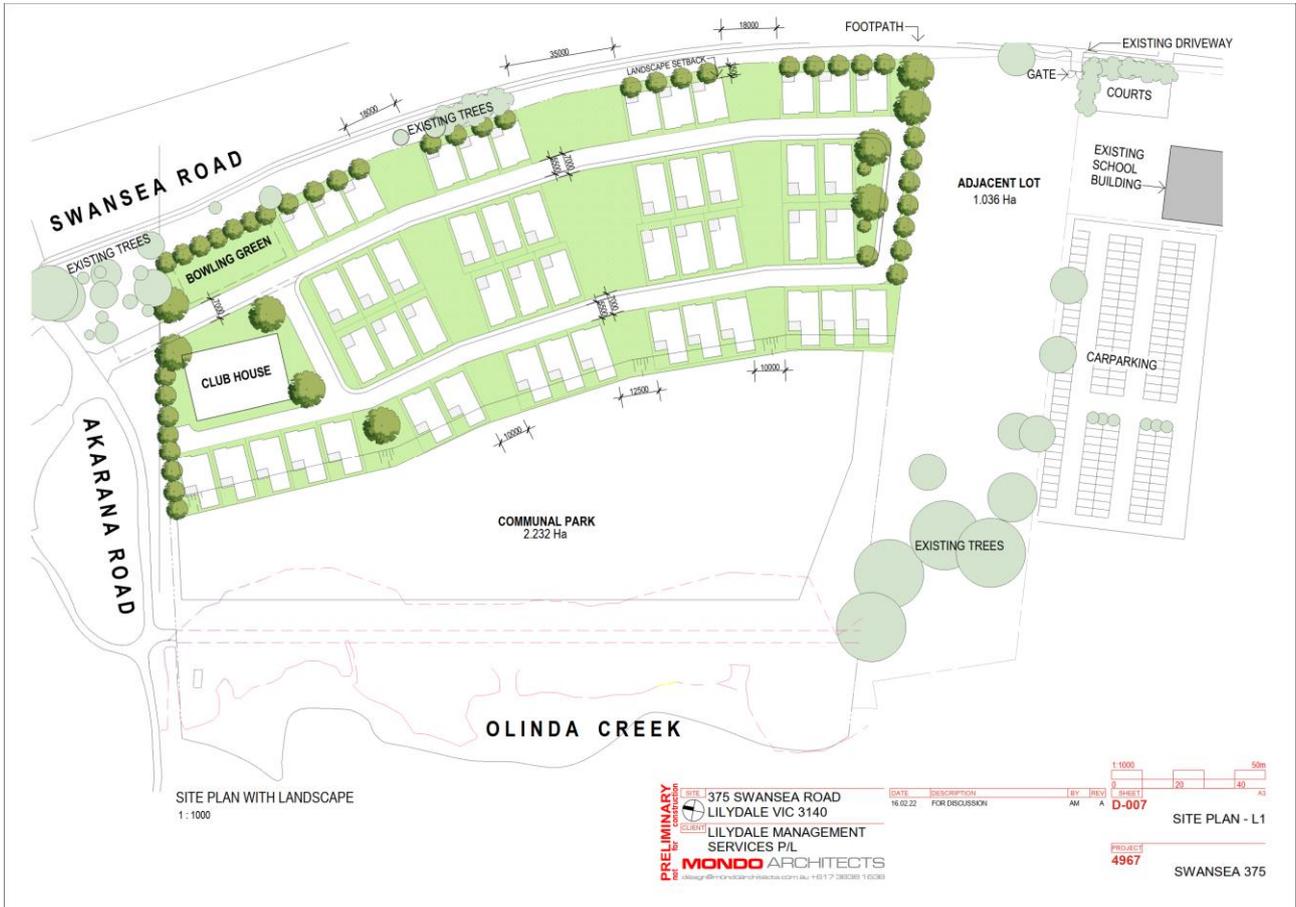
Proposed Development Layout (Source: Hamilton Corporation)
